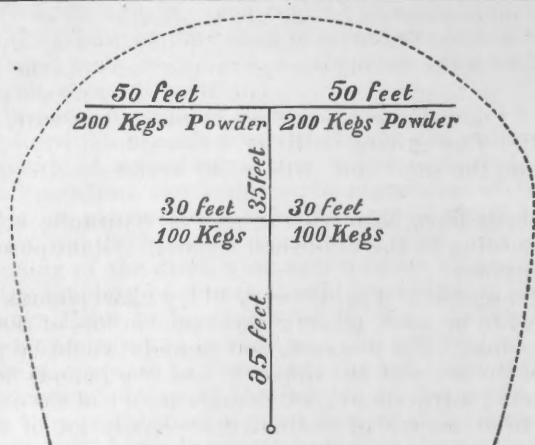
Ground-plan of heavy blast. (See pp. 404, 405, 406.)
